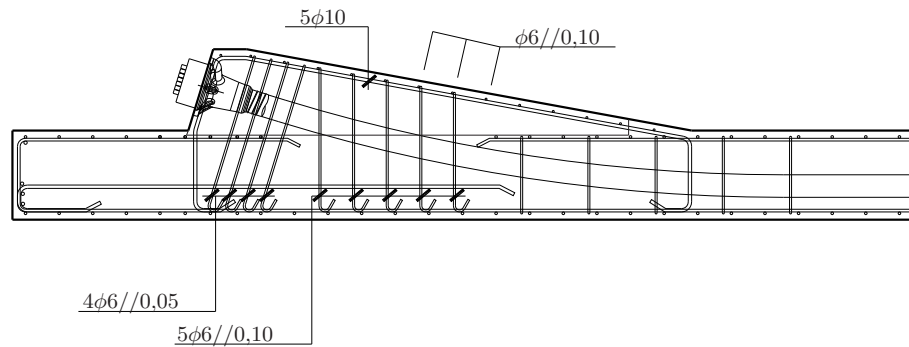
Reinforcement in the blister anchorage zone for tendons A and B
